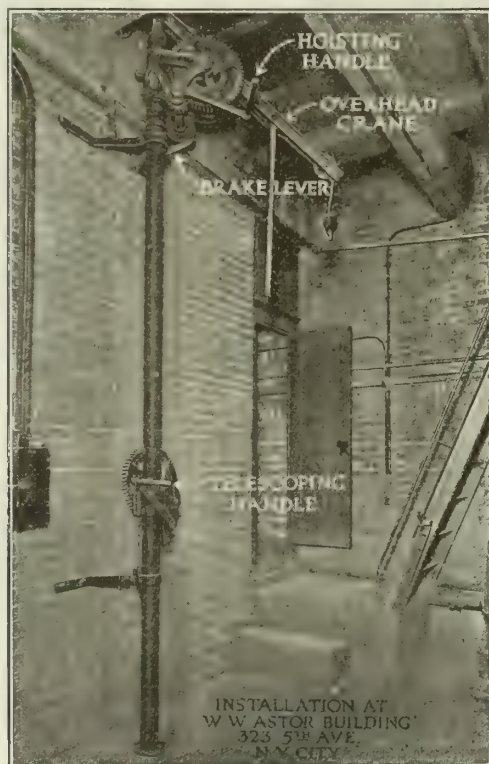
WHEN NOT IN USE MODEL B HOIST TELESCOPES AND NO PART SHOWS ABOVE GRADE LEVEL. SIDEWALK DOORS MAY BE CLOSED DOWN FLUSH WITH PAVEMENT
